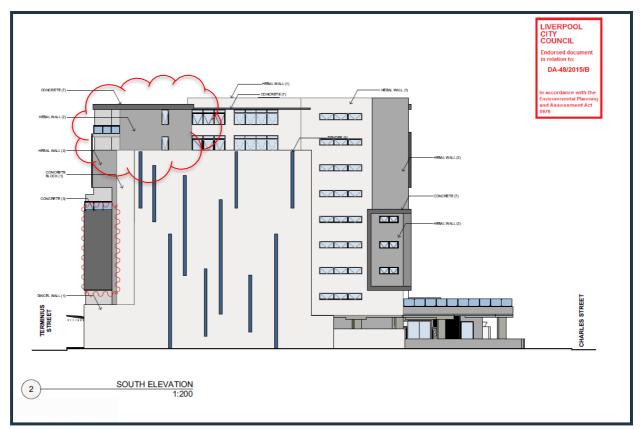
South Elevation of adjoining mixed-use building at 166-176 Terminus Street, Liverpool approved under DA48/2015. The area within red cloud denotes the building depth of Level 7 & 8 and does not extend the length of the site.
